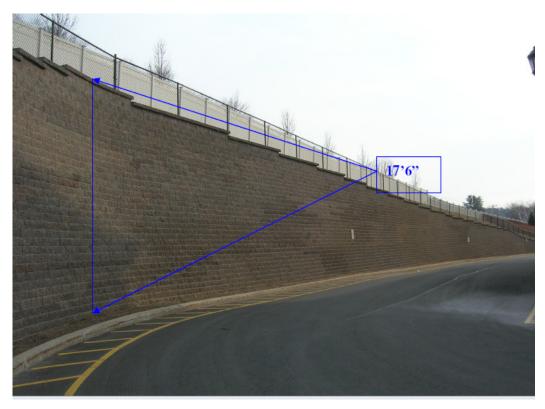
Retaining Wall along Route 44, Behind Shoprite
